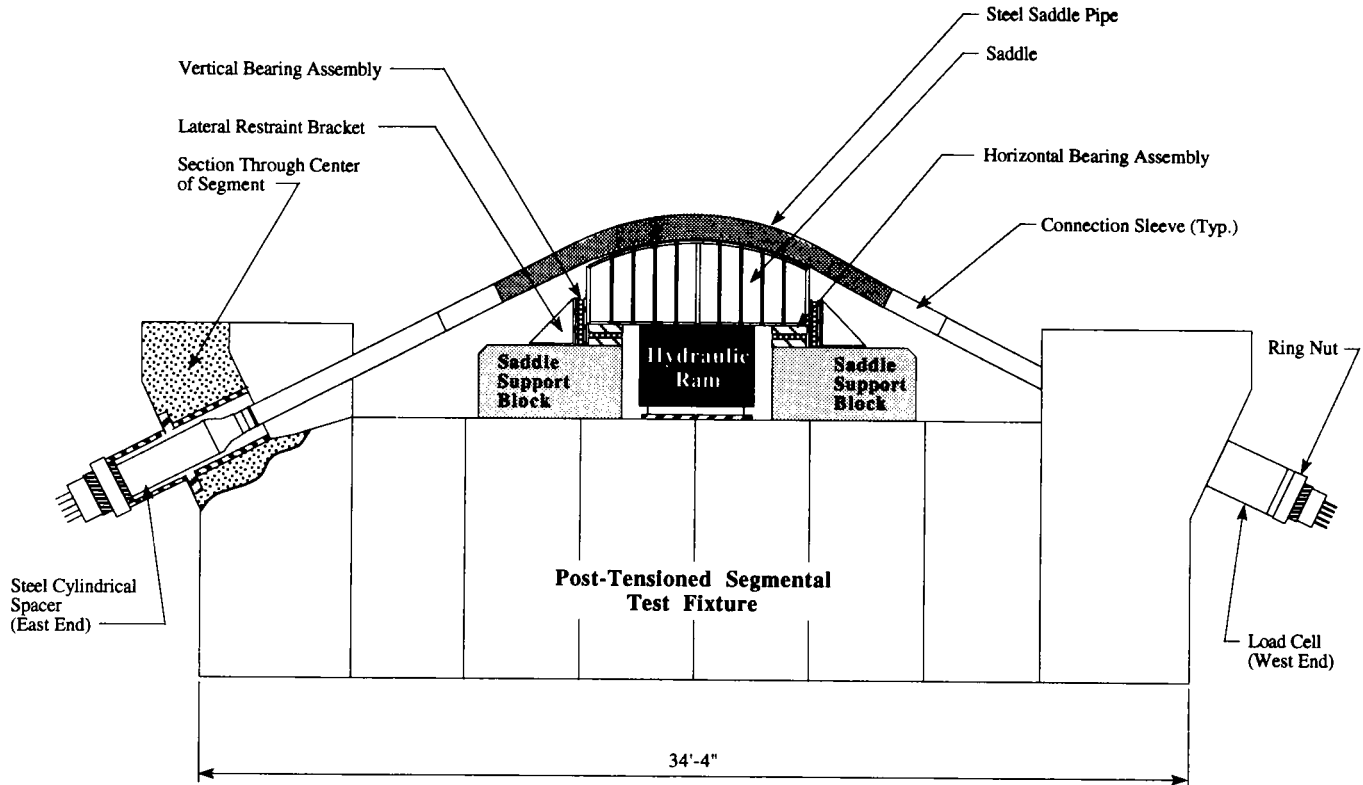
Test fixture for combined axial/flexural fatigue testing.
